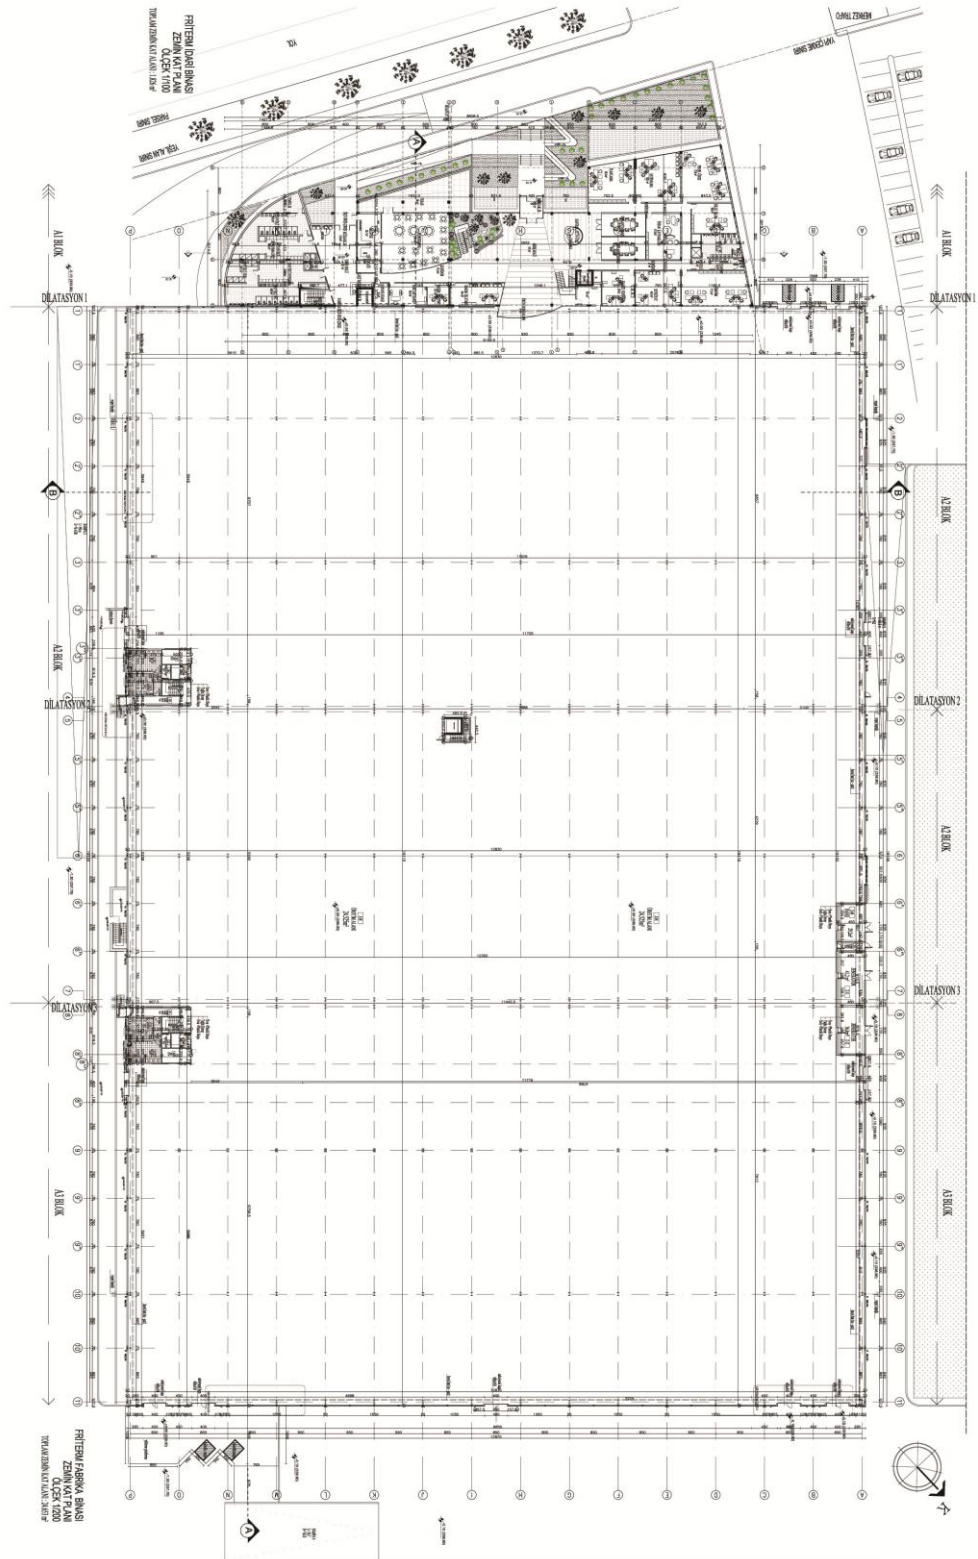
9: Case study B Ground Floor Plan
